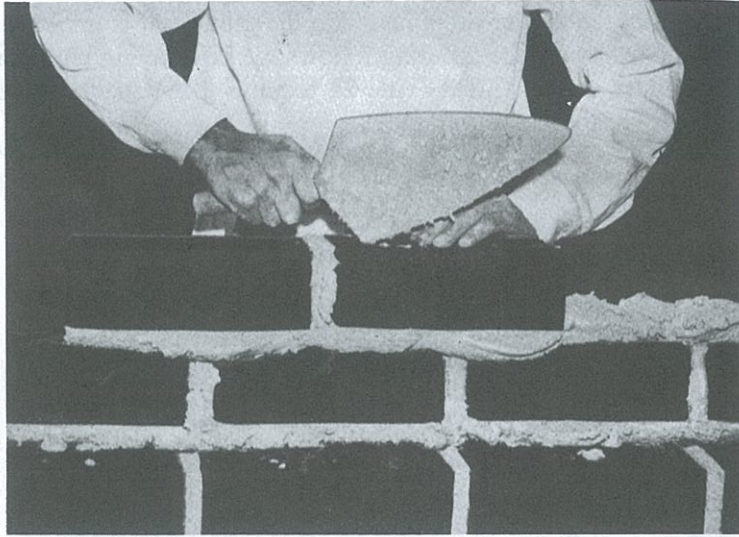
Furrowed bed joint. Too much overhang in grout space. Not recommended.
